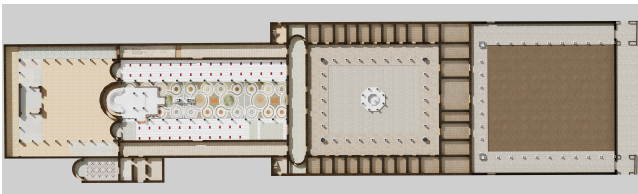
Ground Floor Plan of Hypothetical Reconstruction
